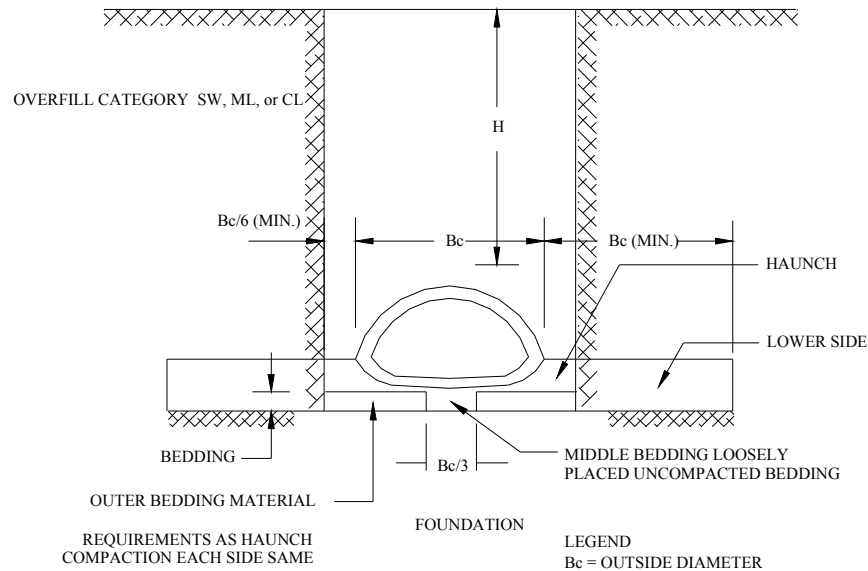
Embankment Beddings, Miscellaneous Shapes
